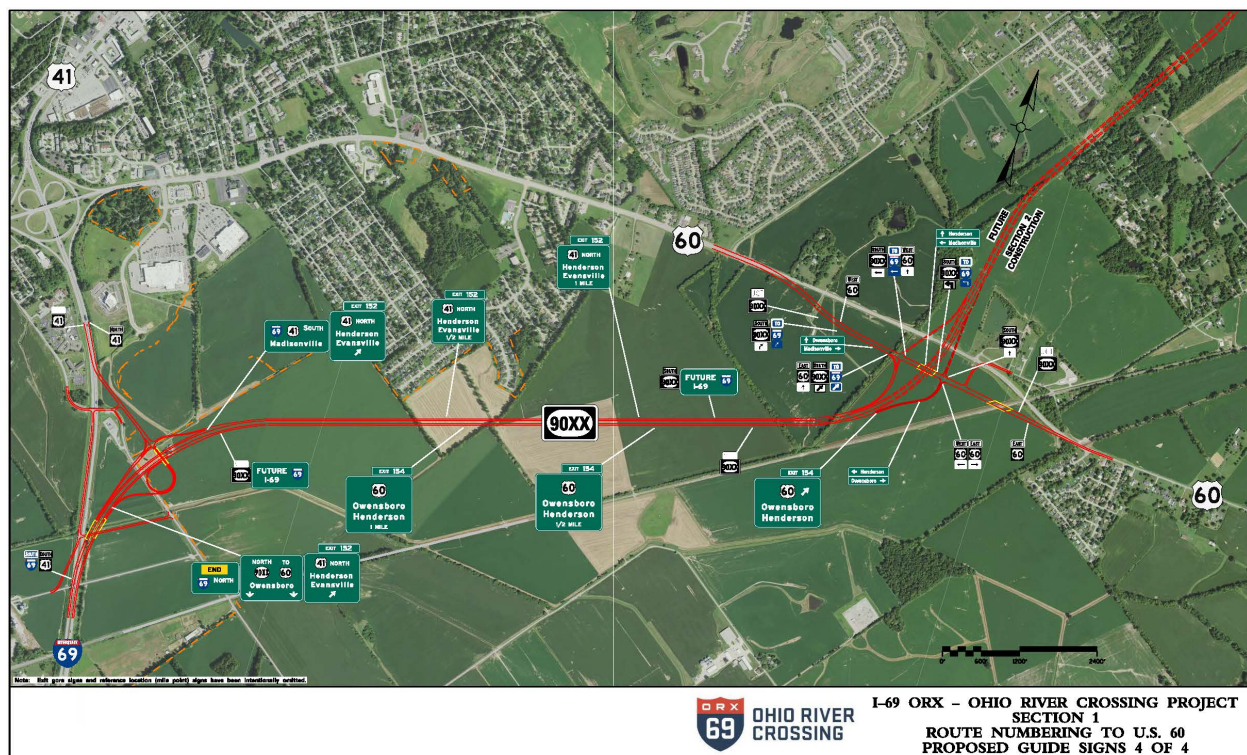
Proposed Guide Signs Sheet 4 of 4
